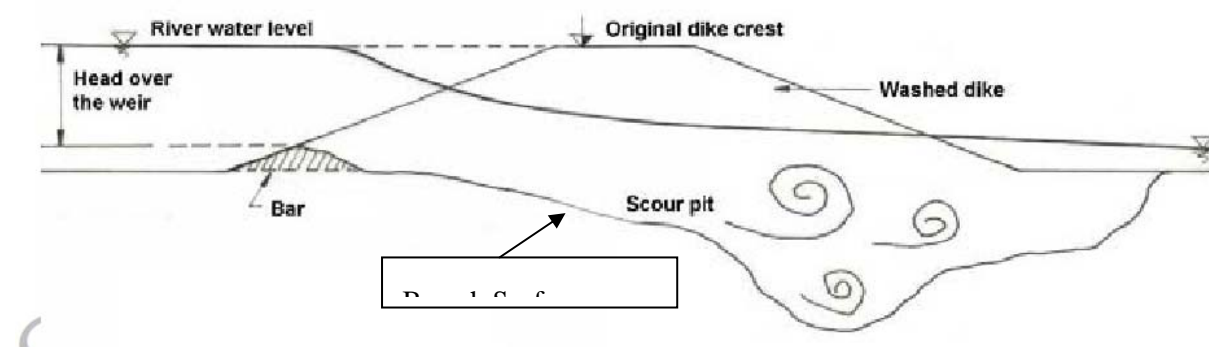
Typical Cross Section of a Dike Failure (2)
